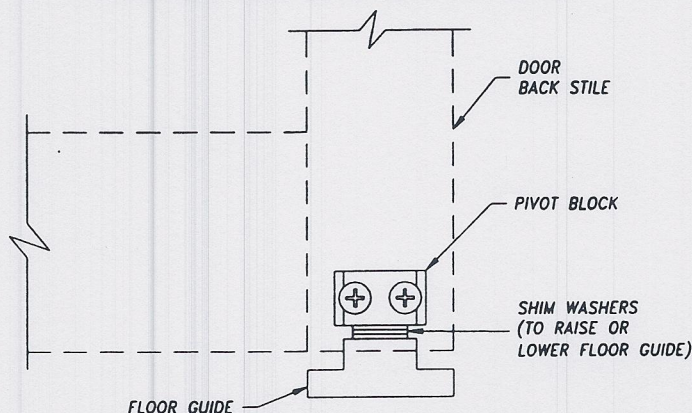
Installation of Door (SX) Bottom Pivot Assembly
